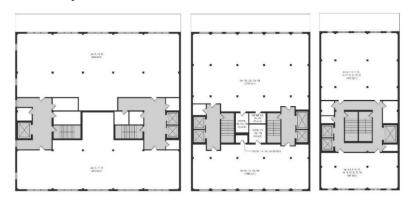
Plan of Building 16 (left), Building 17 (middle), and Building 18 (right), with core areas highlighted in dark tone. Plans oriented so that the street front would be down.
